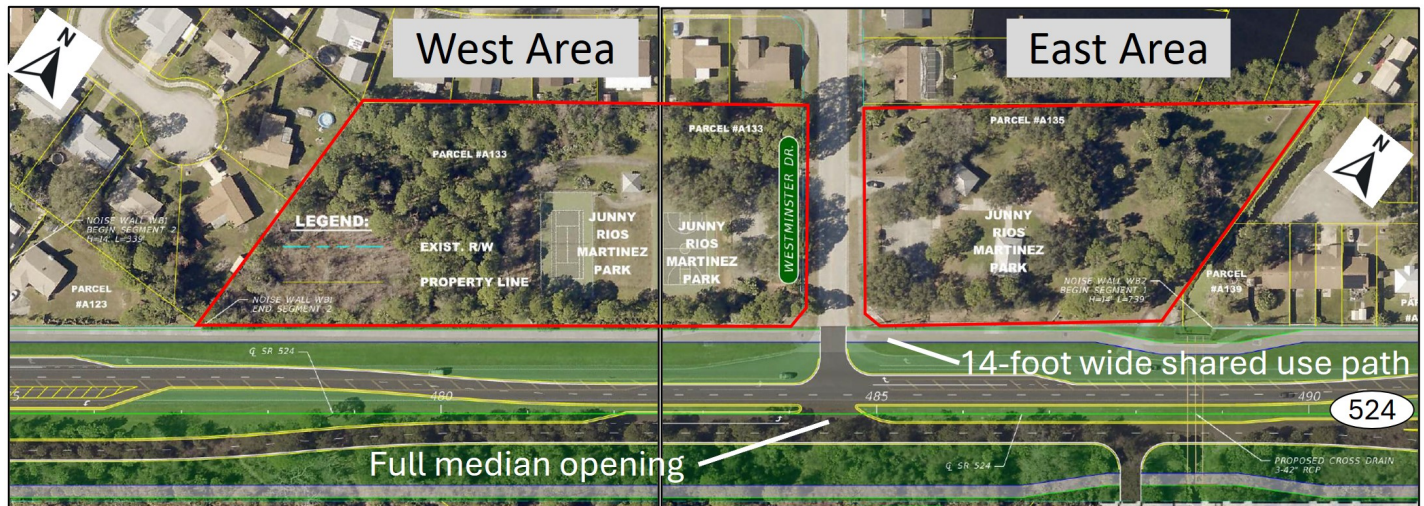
Concept Plans Showing Project Improvements Adjacent to Park
